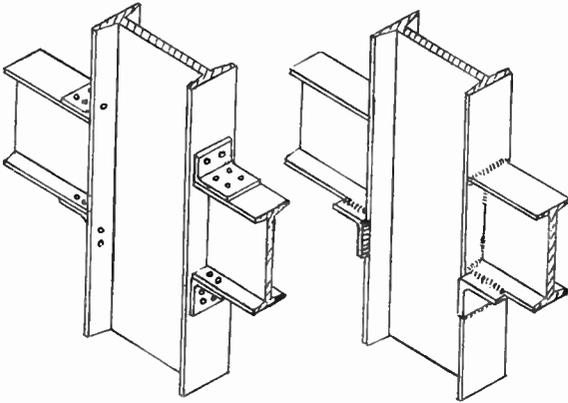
COMPARISON BETWEEN A COMMON JOINT IN BUILDING STRUCTURE EXECUTED IN RIVETING AND WELDING.
